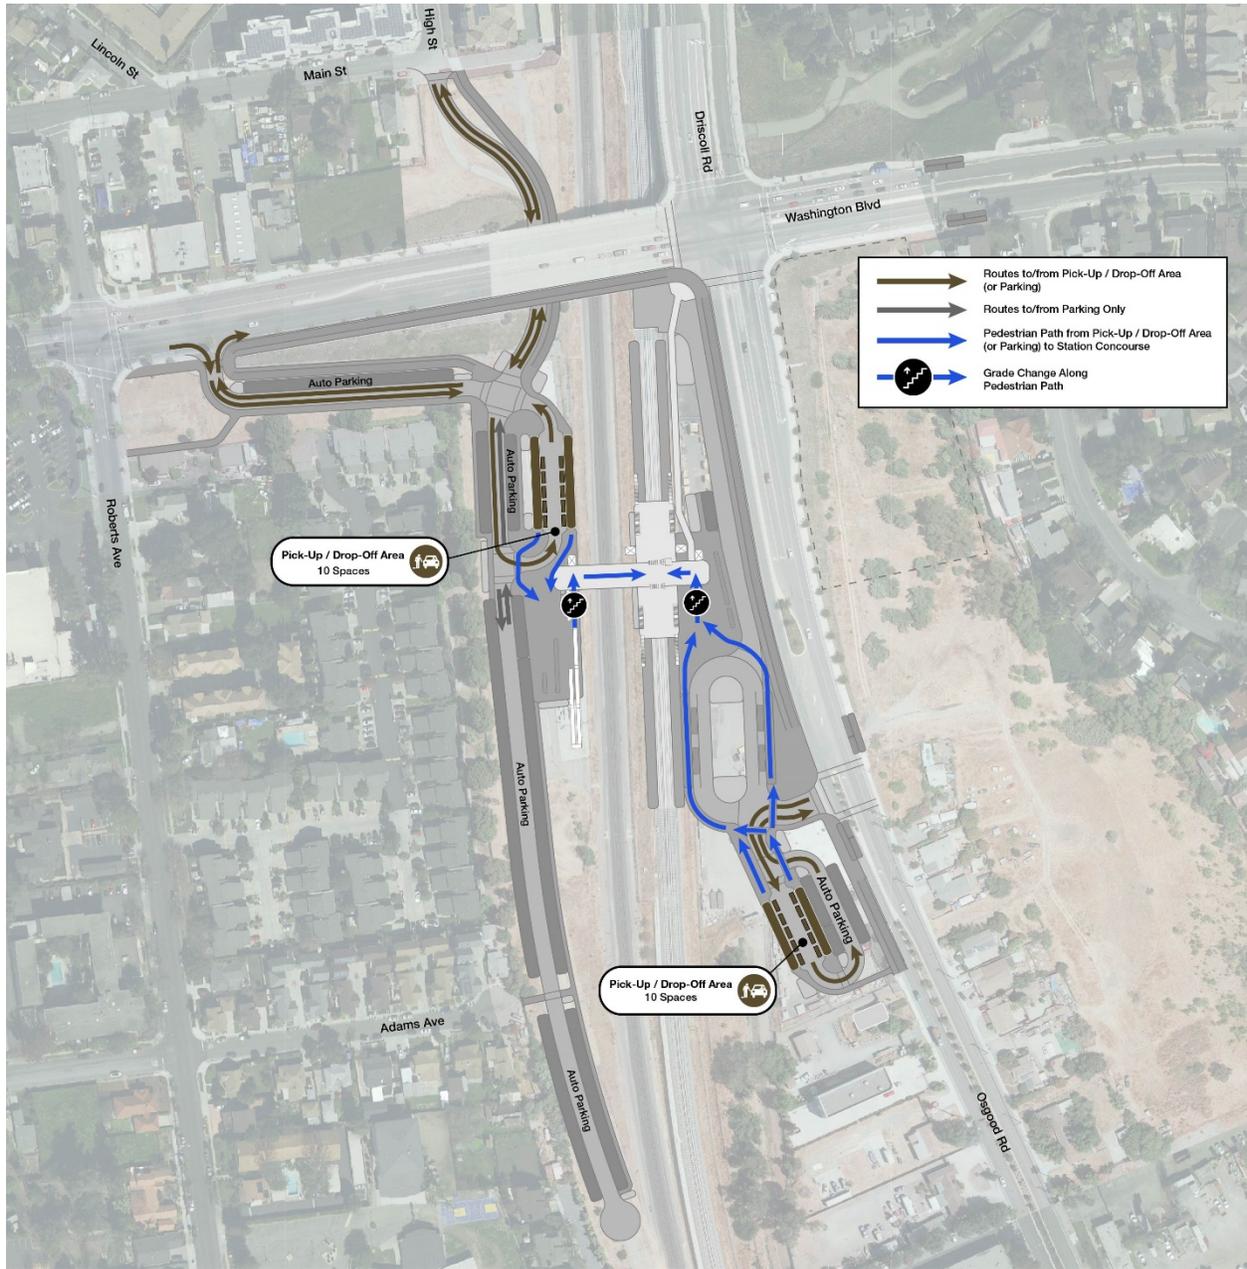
Station Site Auto Access Points and Paths- Alternative B
